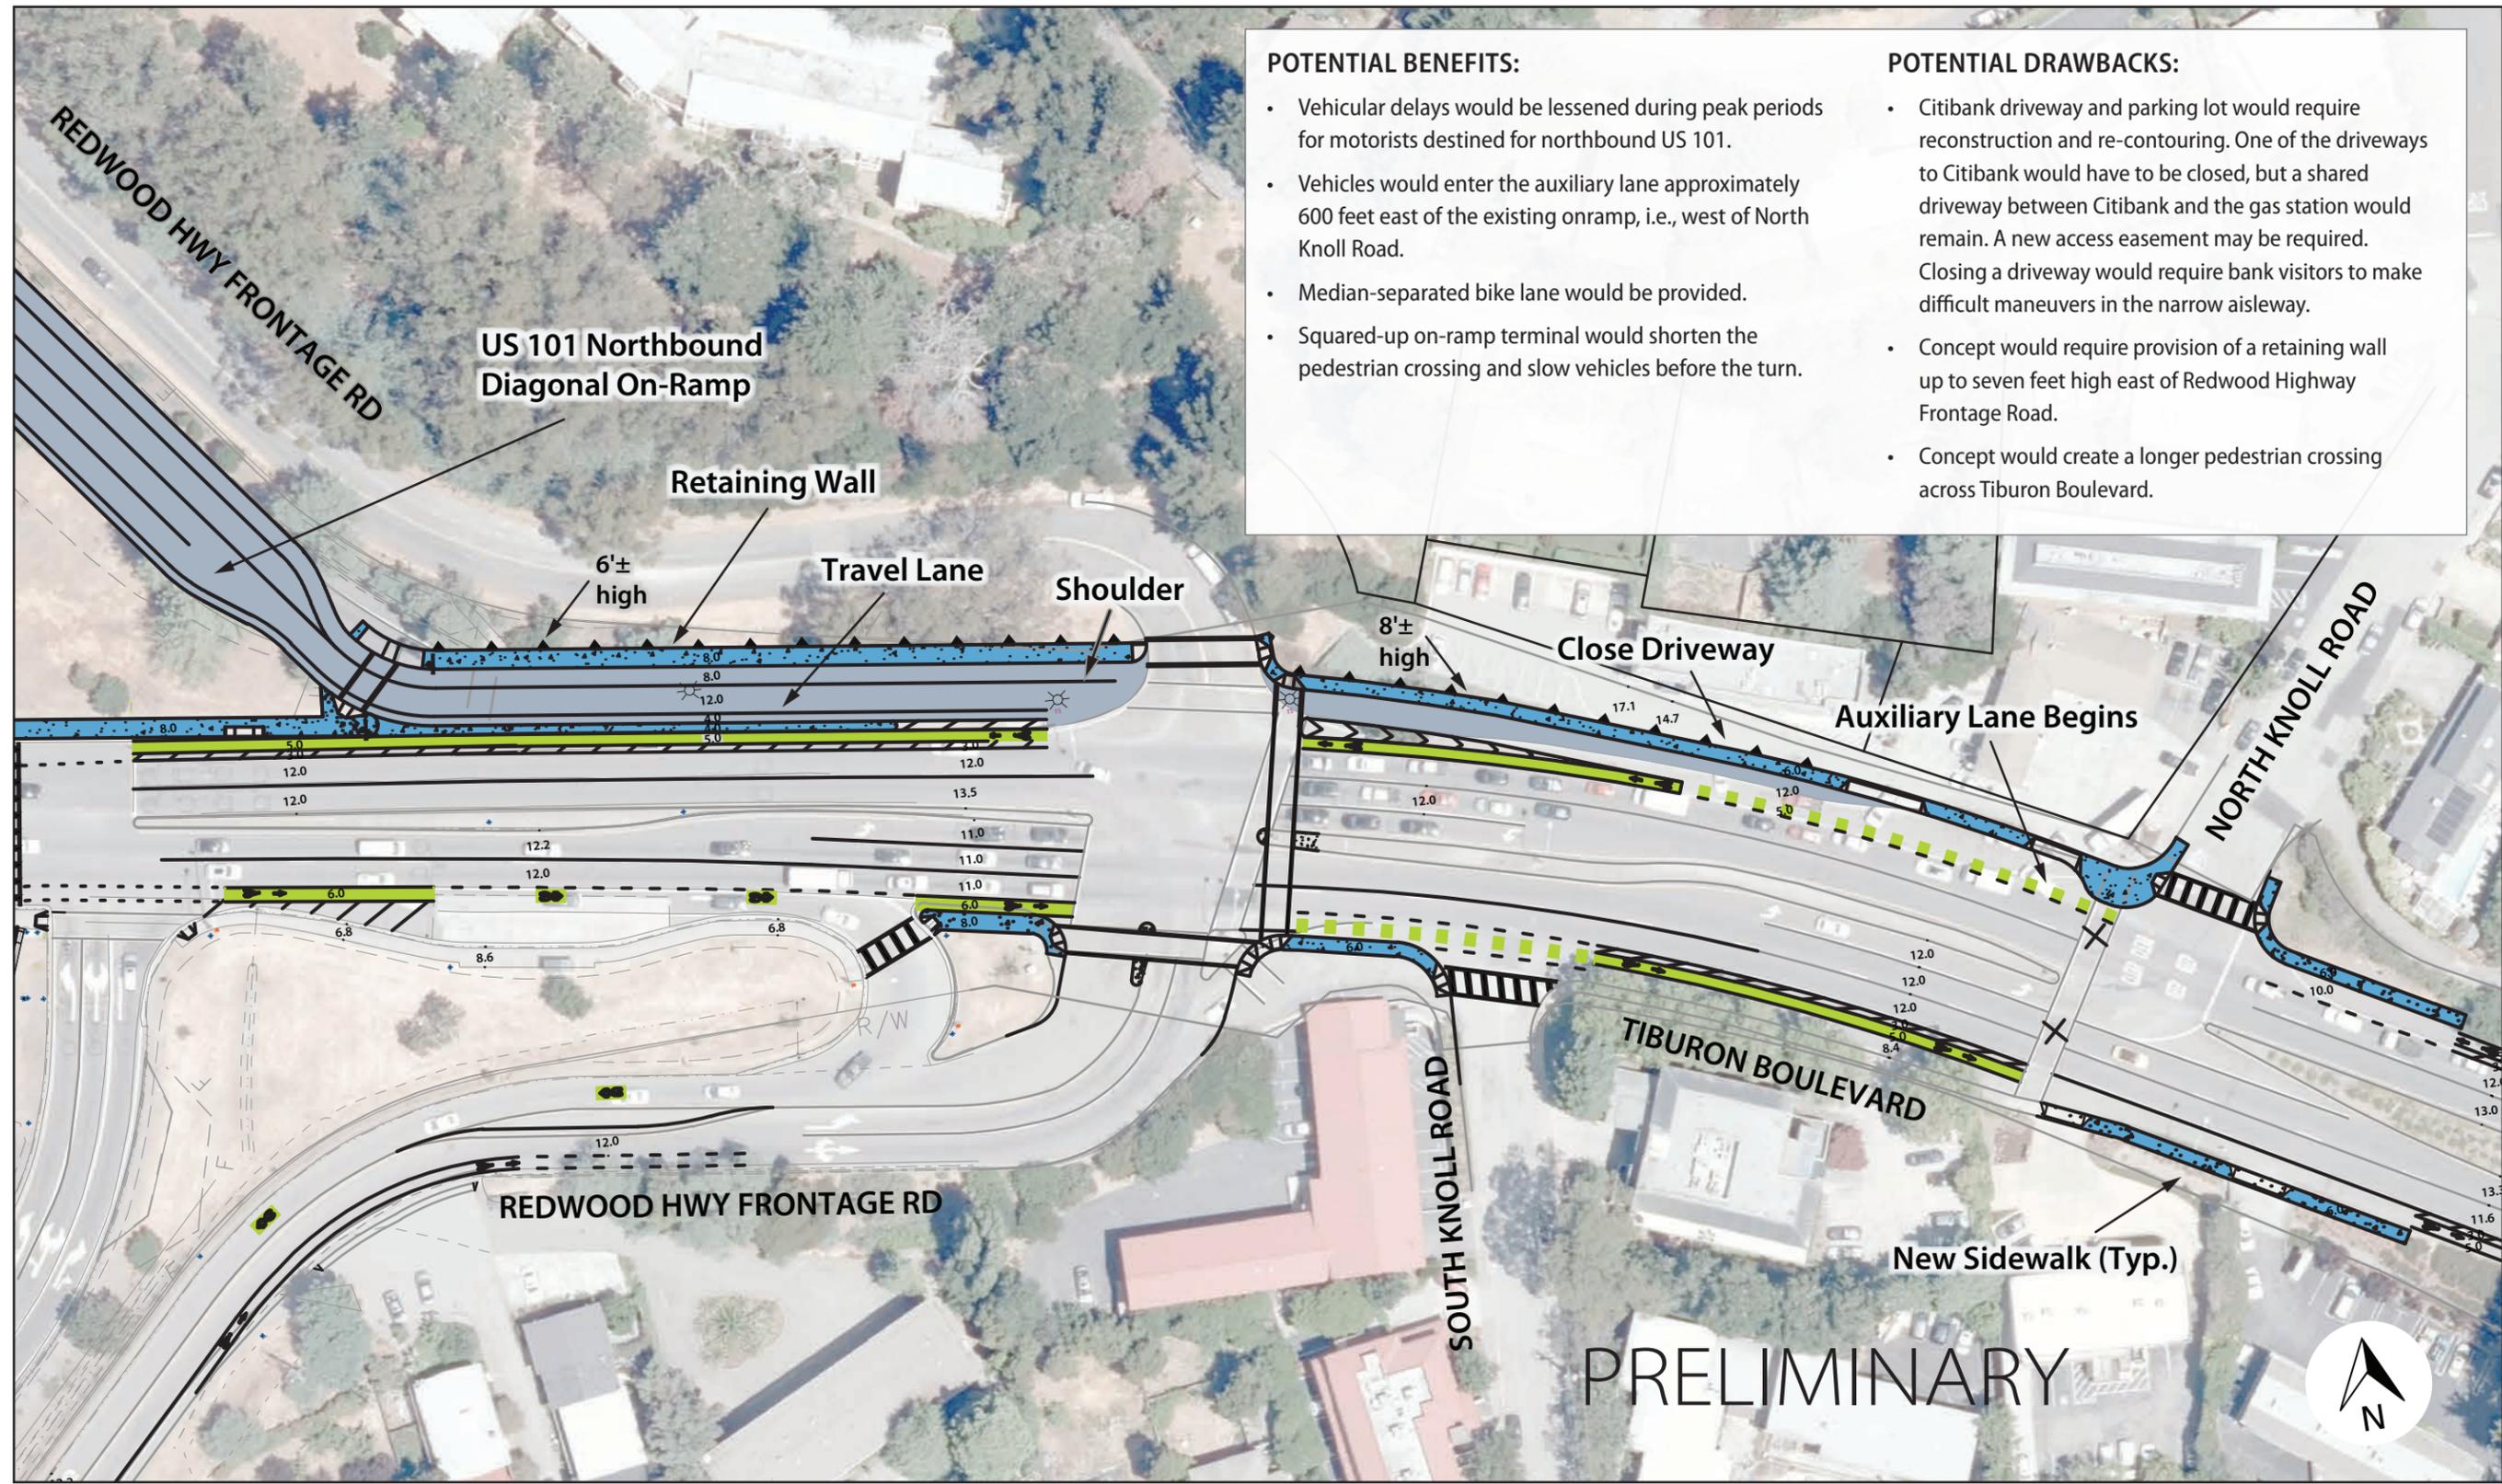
RAMP AUXILIARY LANE; WITH SHOULDER, ADJACENT BIKE LANE & SIDEWALK
